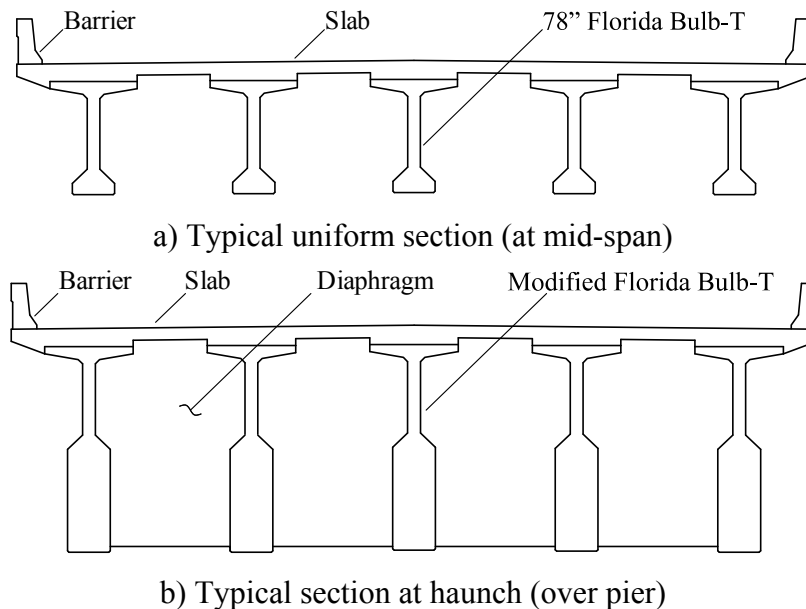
Superstructure cross-sections for the SR-300 Bridge
